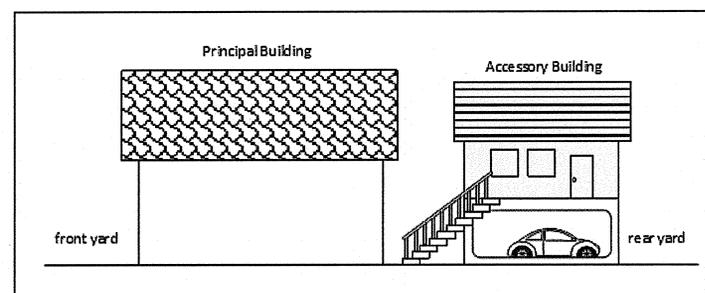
Accessory Dwelling Unit attached to an accessory building.
